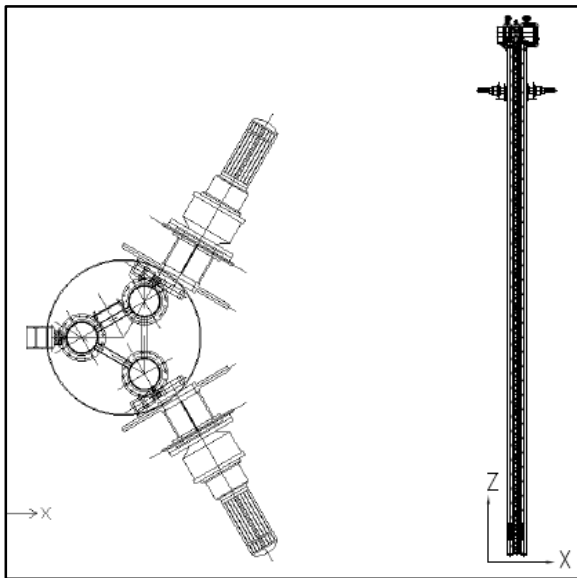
General Arrangement of Raw Water tower Plan & Profile Views
